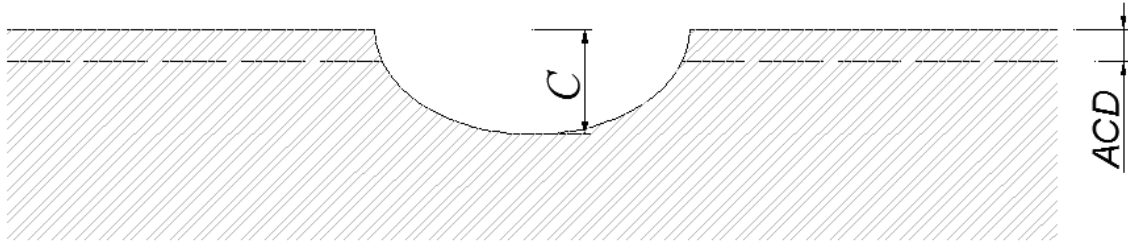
2 Sketch of maximum pitting depth in a corroded pipe wall
